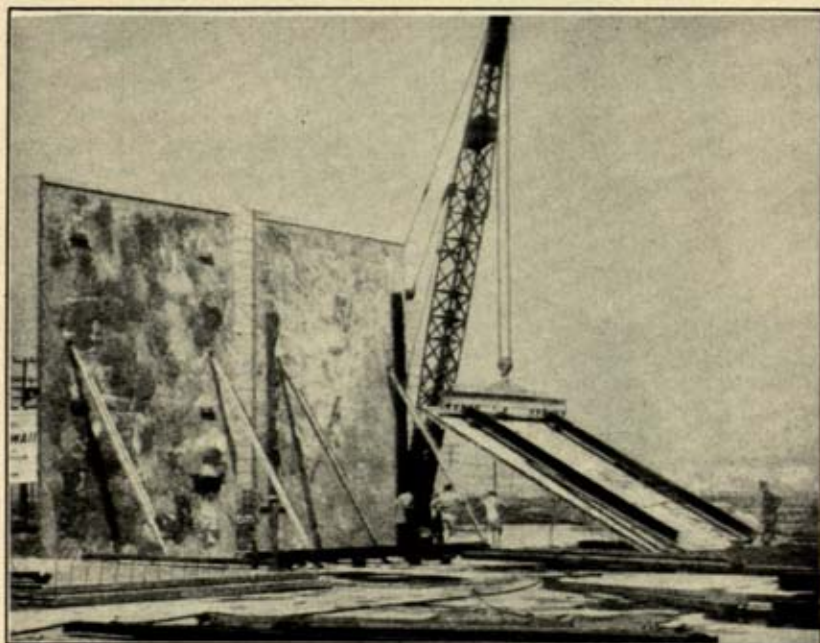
Tilting wall panels 6 in. thick and 28 ft high into position. (*Western Construction.*)
